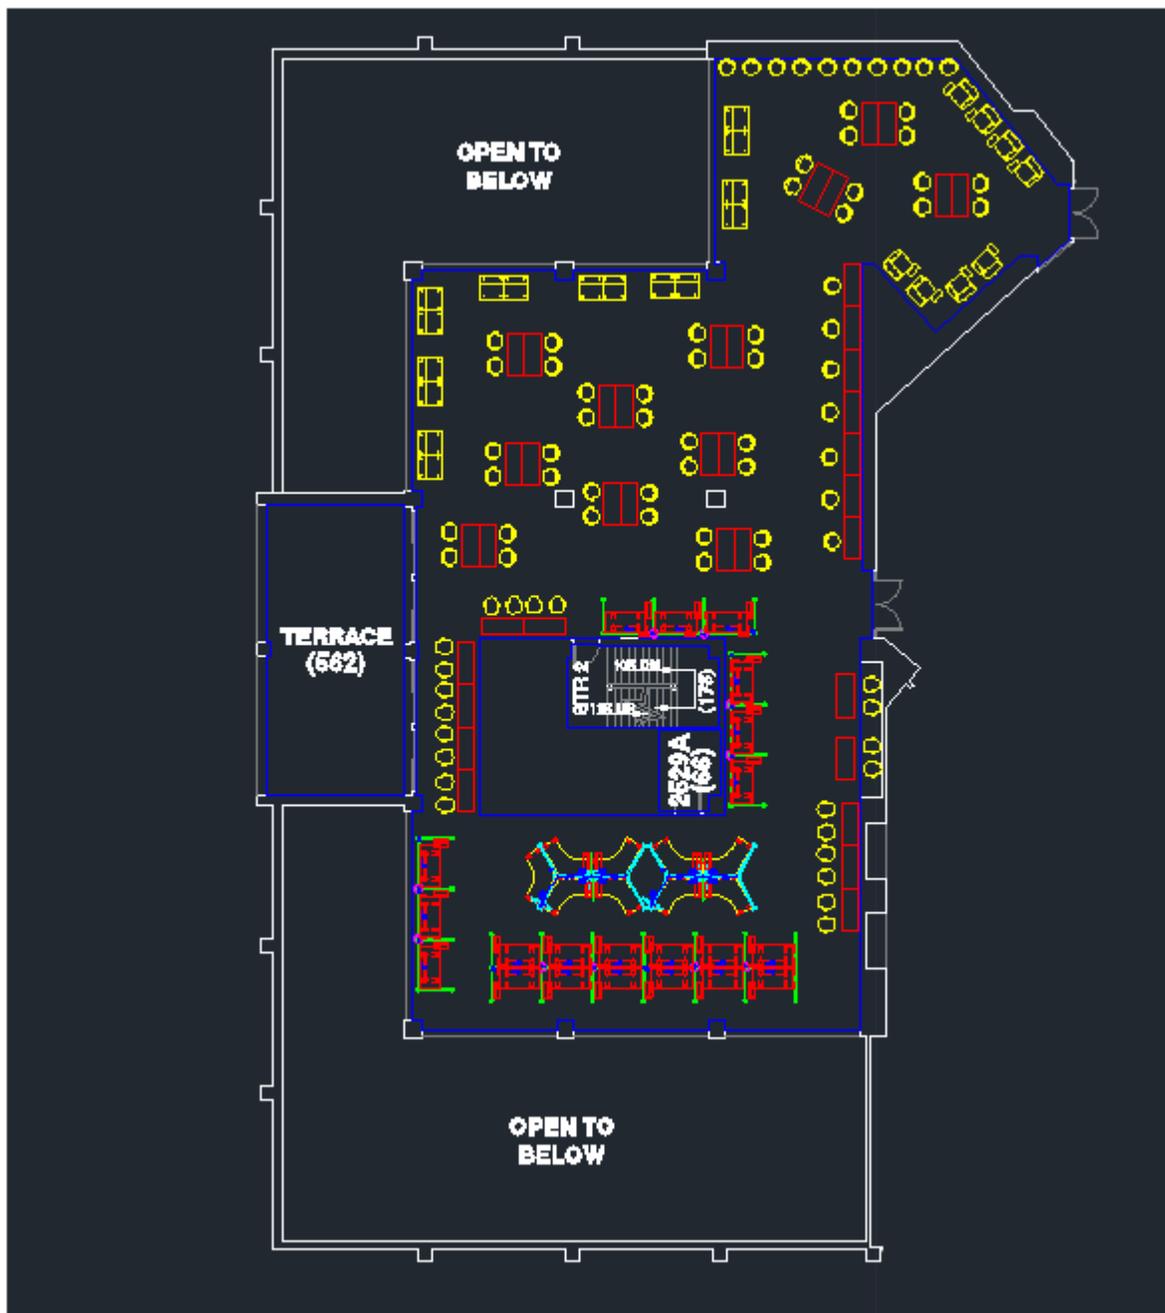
Second Floor Information Commons Redesigned Layout
